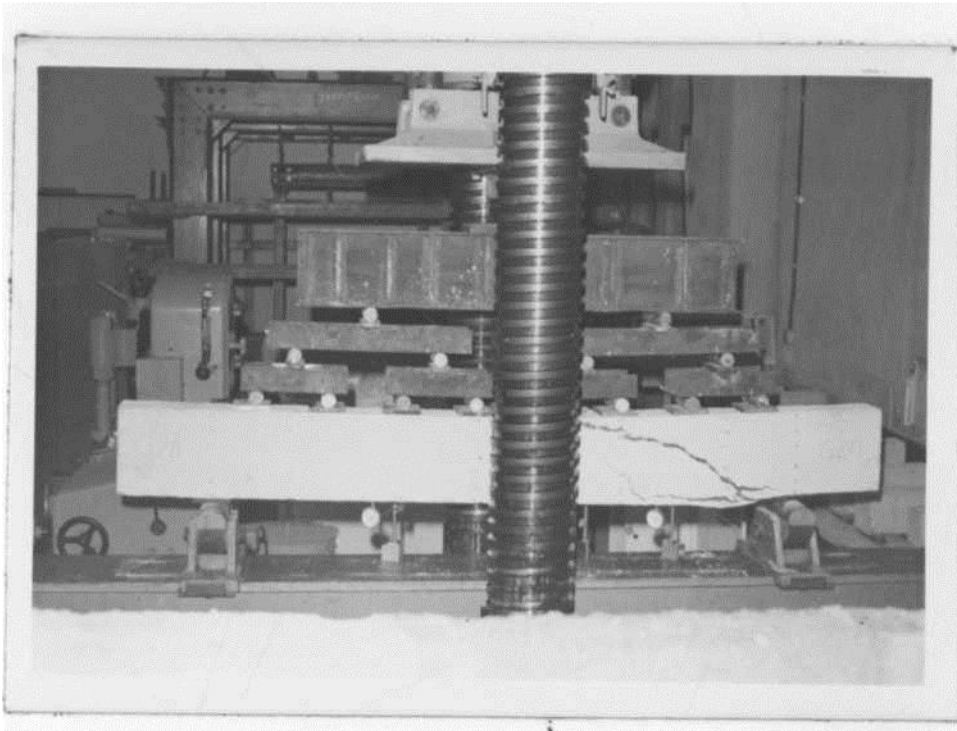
Beam G1/4 showing concrete spalling.
